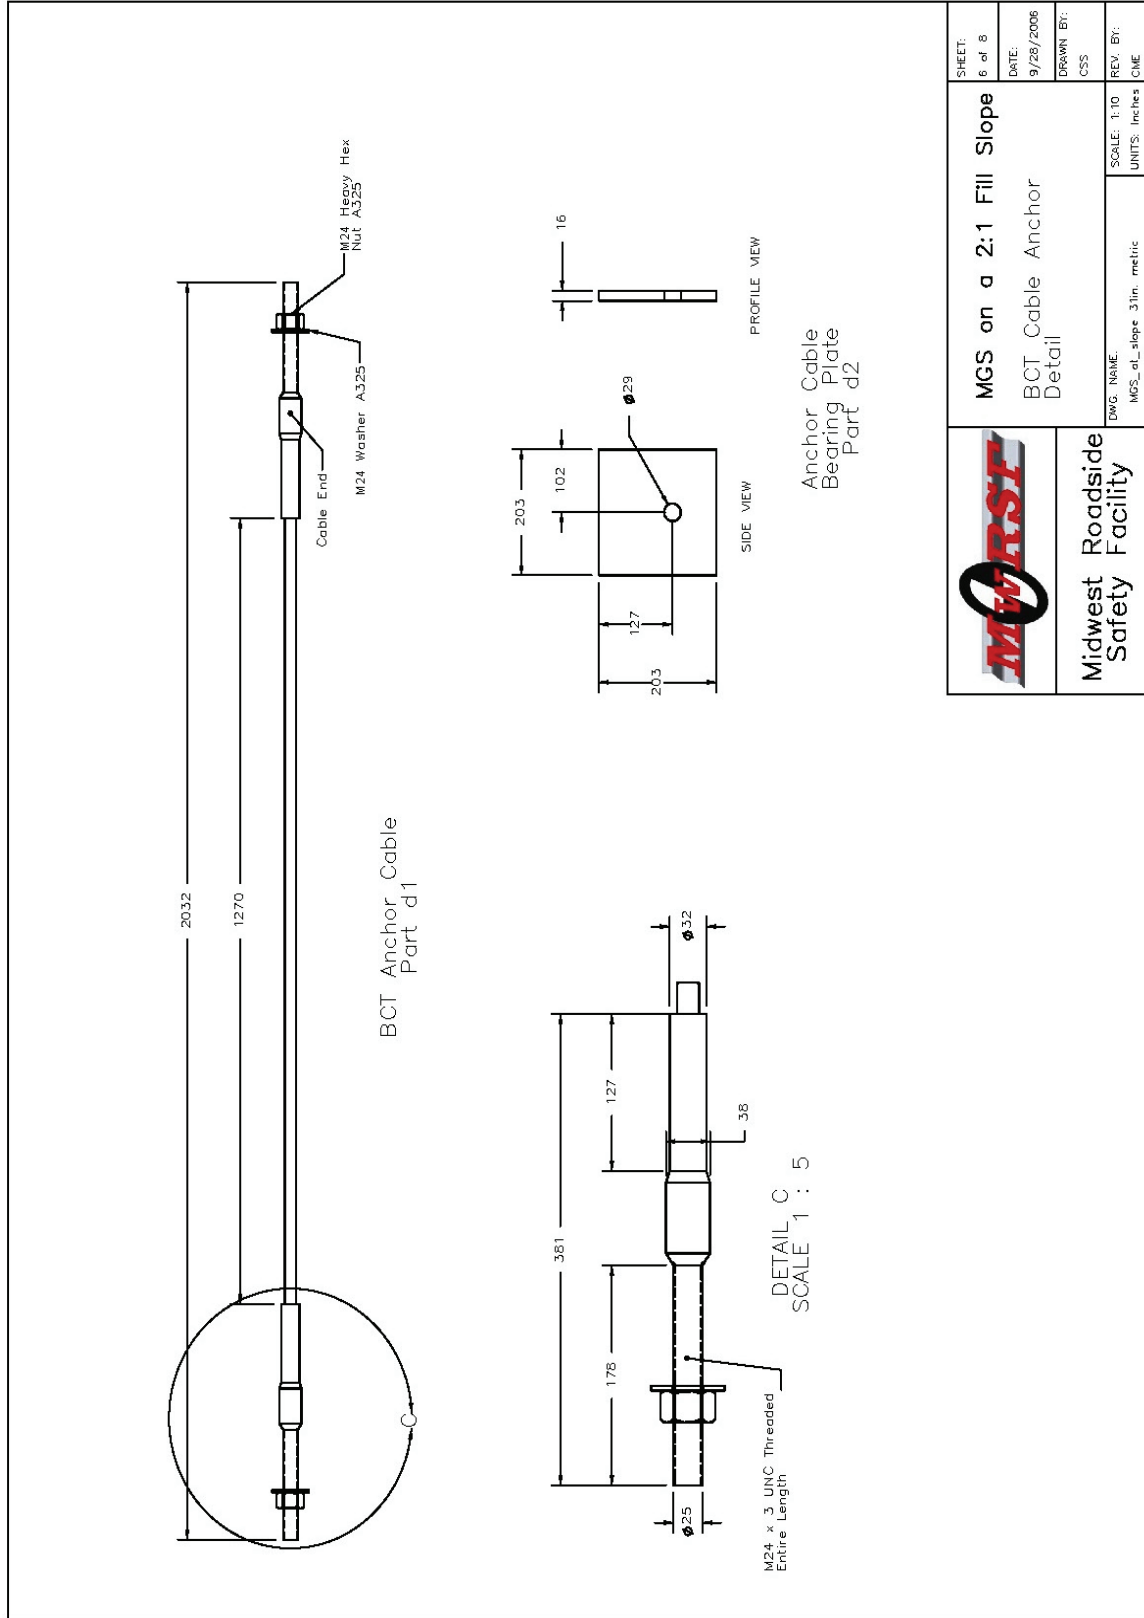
Anchor Cable Details, Test No. MGS221-2 (Metric)
